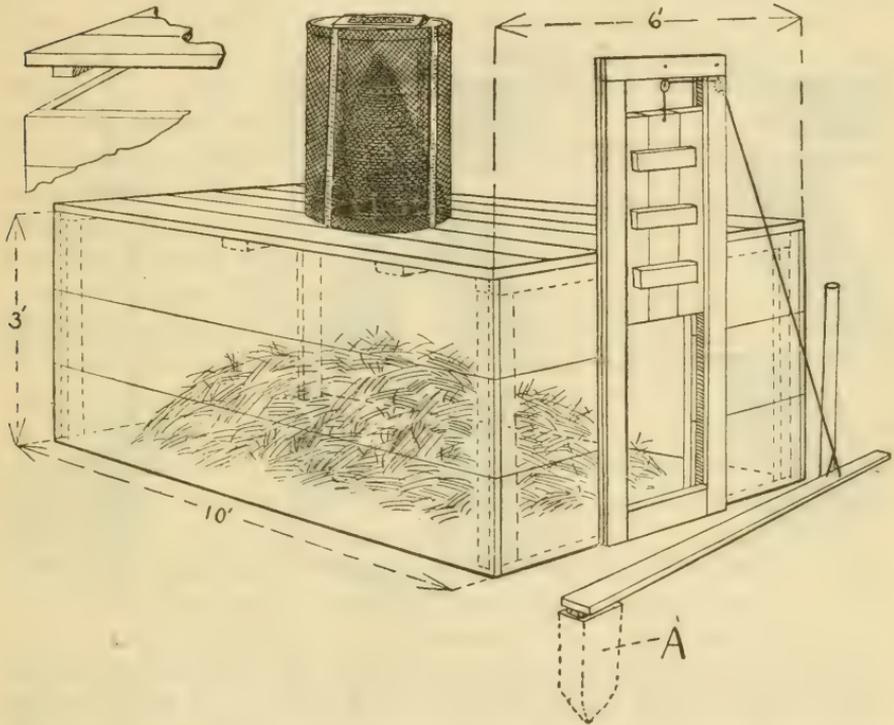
Use of flytrap in connection with manure bin. *A*, Block of wood set in ground to which lever raising door is hinged. (Original.)
